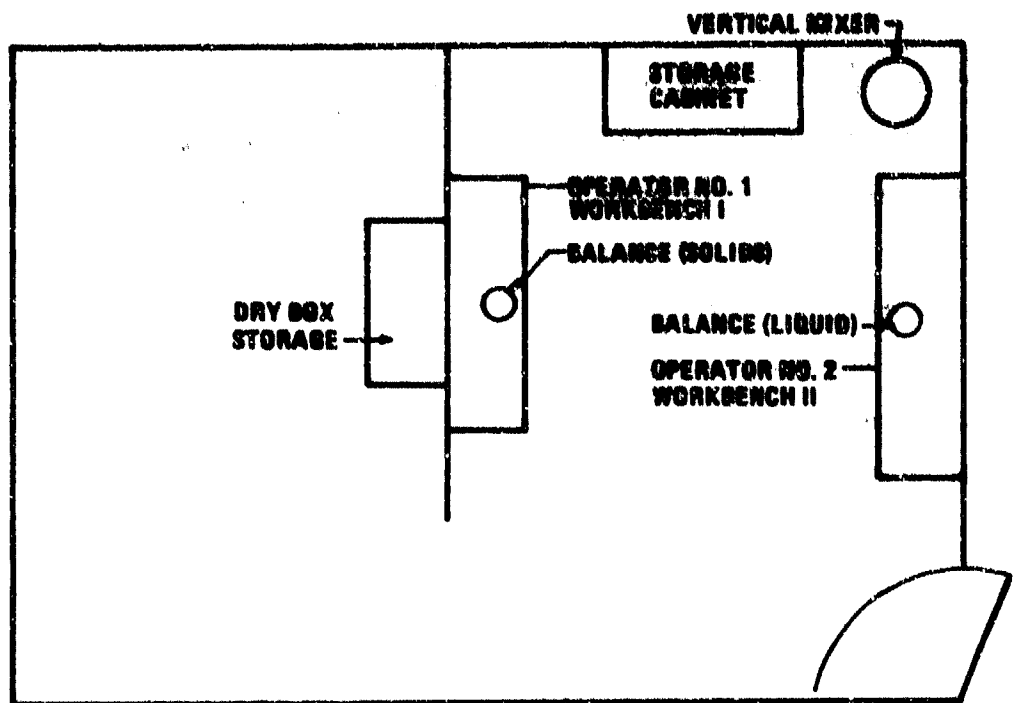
BUILDING LAYOUT WHERE EXPLOSION OCCURRED
